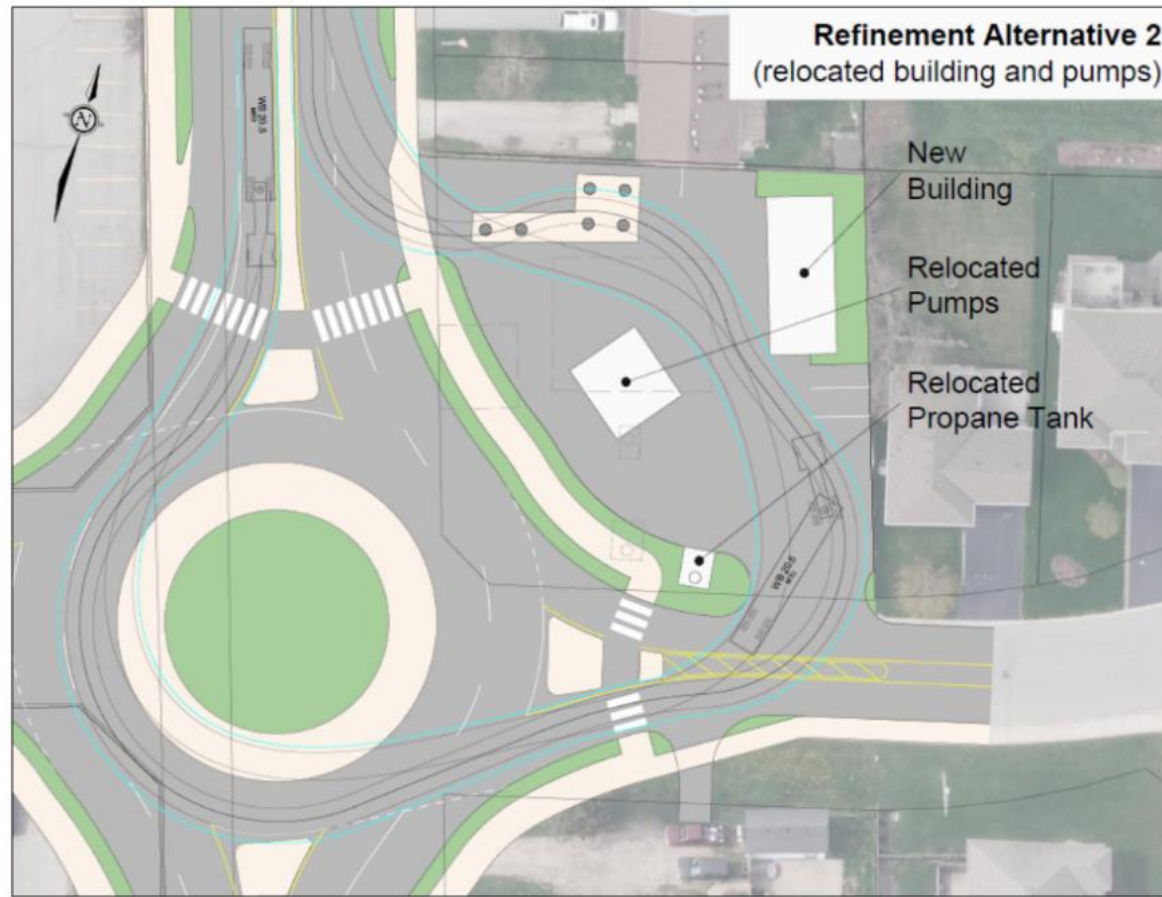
Refinement Alternative B - Shell Gas Relocation 2
